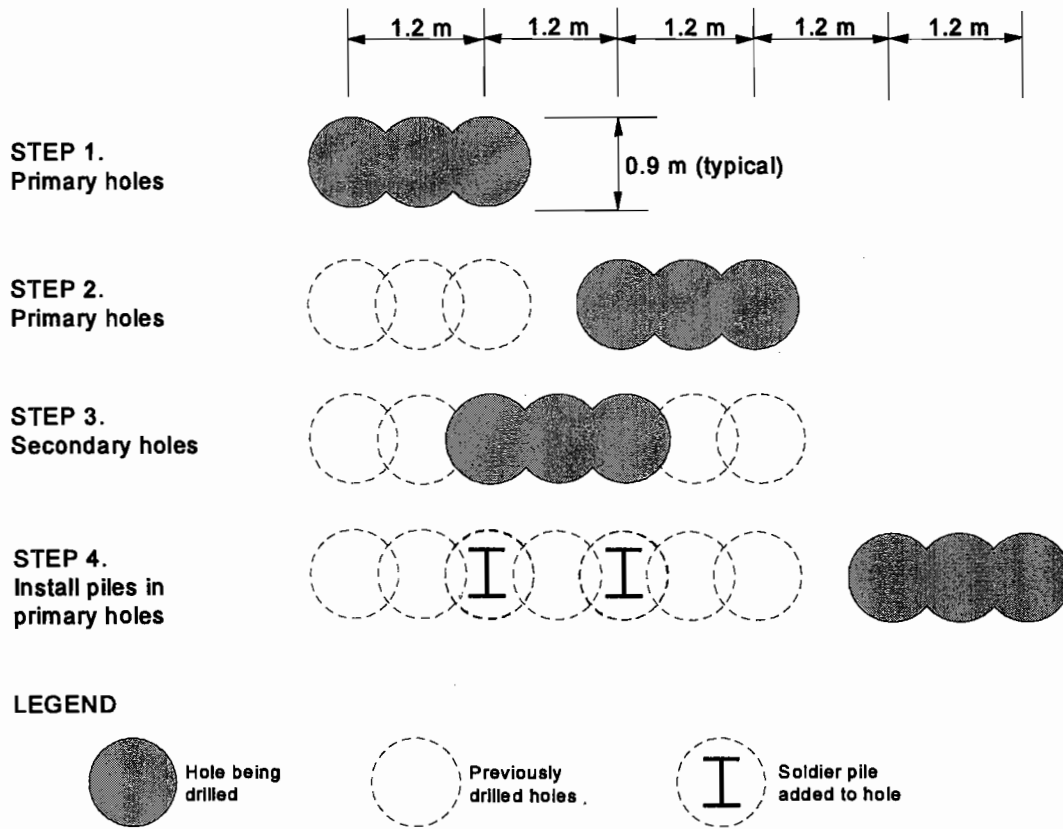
Construction sequence for soil mixed walls (modified after Pearlman and Himick, 1993, Anchored Excavation Support Using SMW, Deep Foundations Institute (DFI). Reprinted by permission of DFI).
